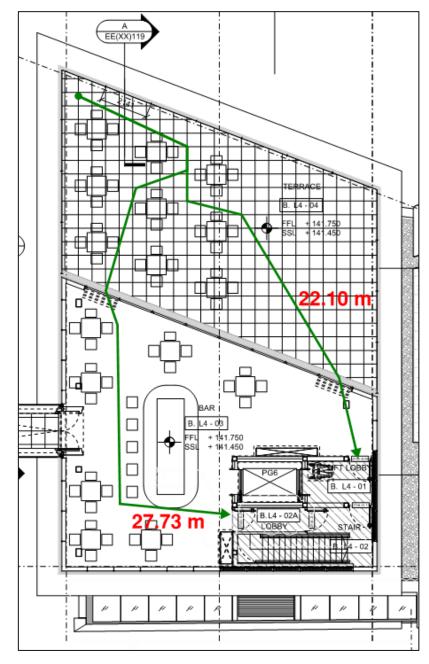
5 Level 4 Rooftop Bar- Egress Routes
